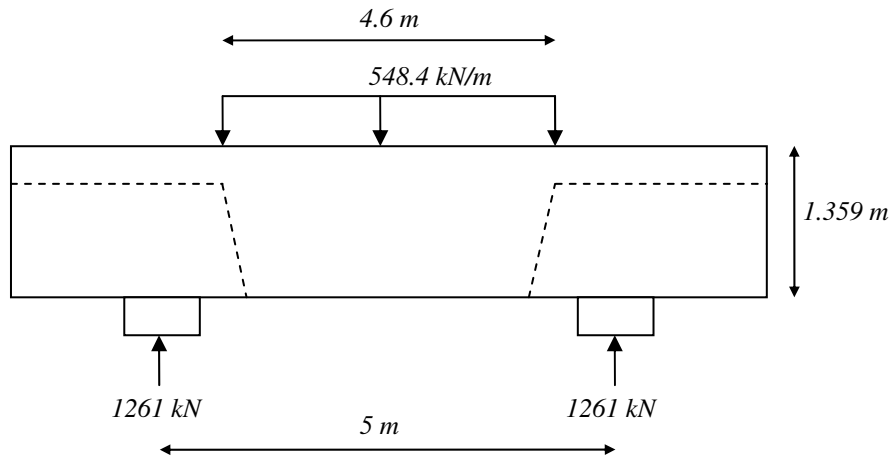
Structural model used in hand calculation of principal stresses for the transversal beam of bridge 16-935-1.
